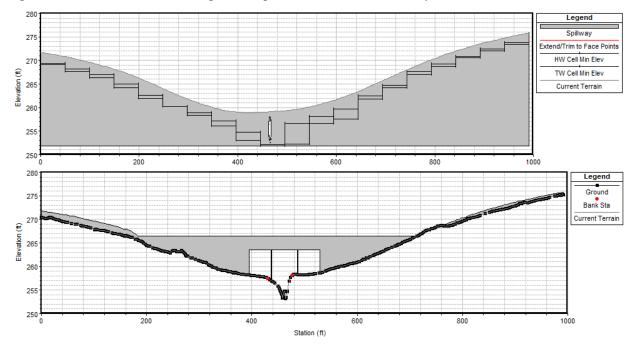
Alternative PA3 Existing and Proposed Cross-Sections on Riley Road at Walnut Creek Tributary #1
